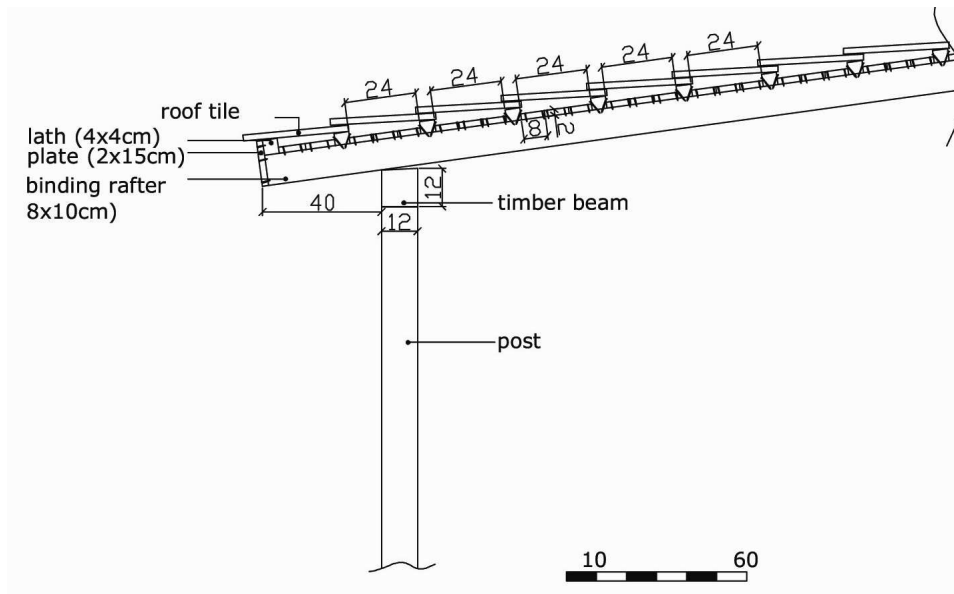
44 Drawing of the roof- timber wall connection. Çelik 2008.
